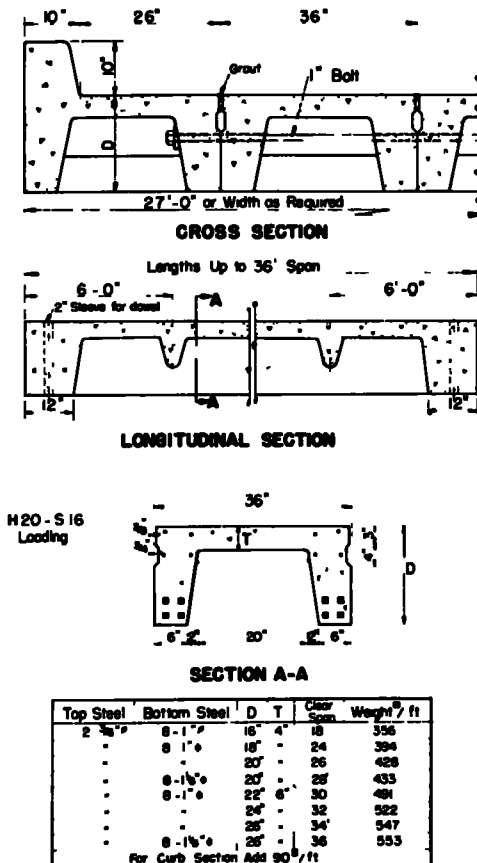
Type of Precast Deck Used in Pennsylvania - Main Reinforcement Only is Shown
